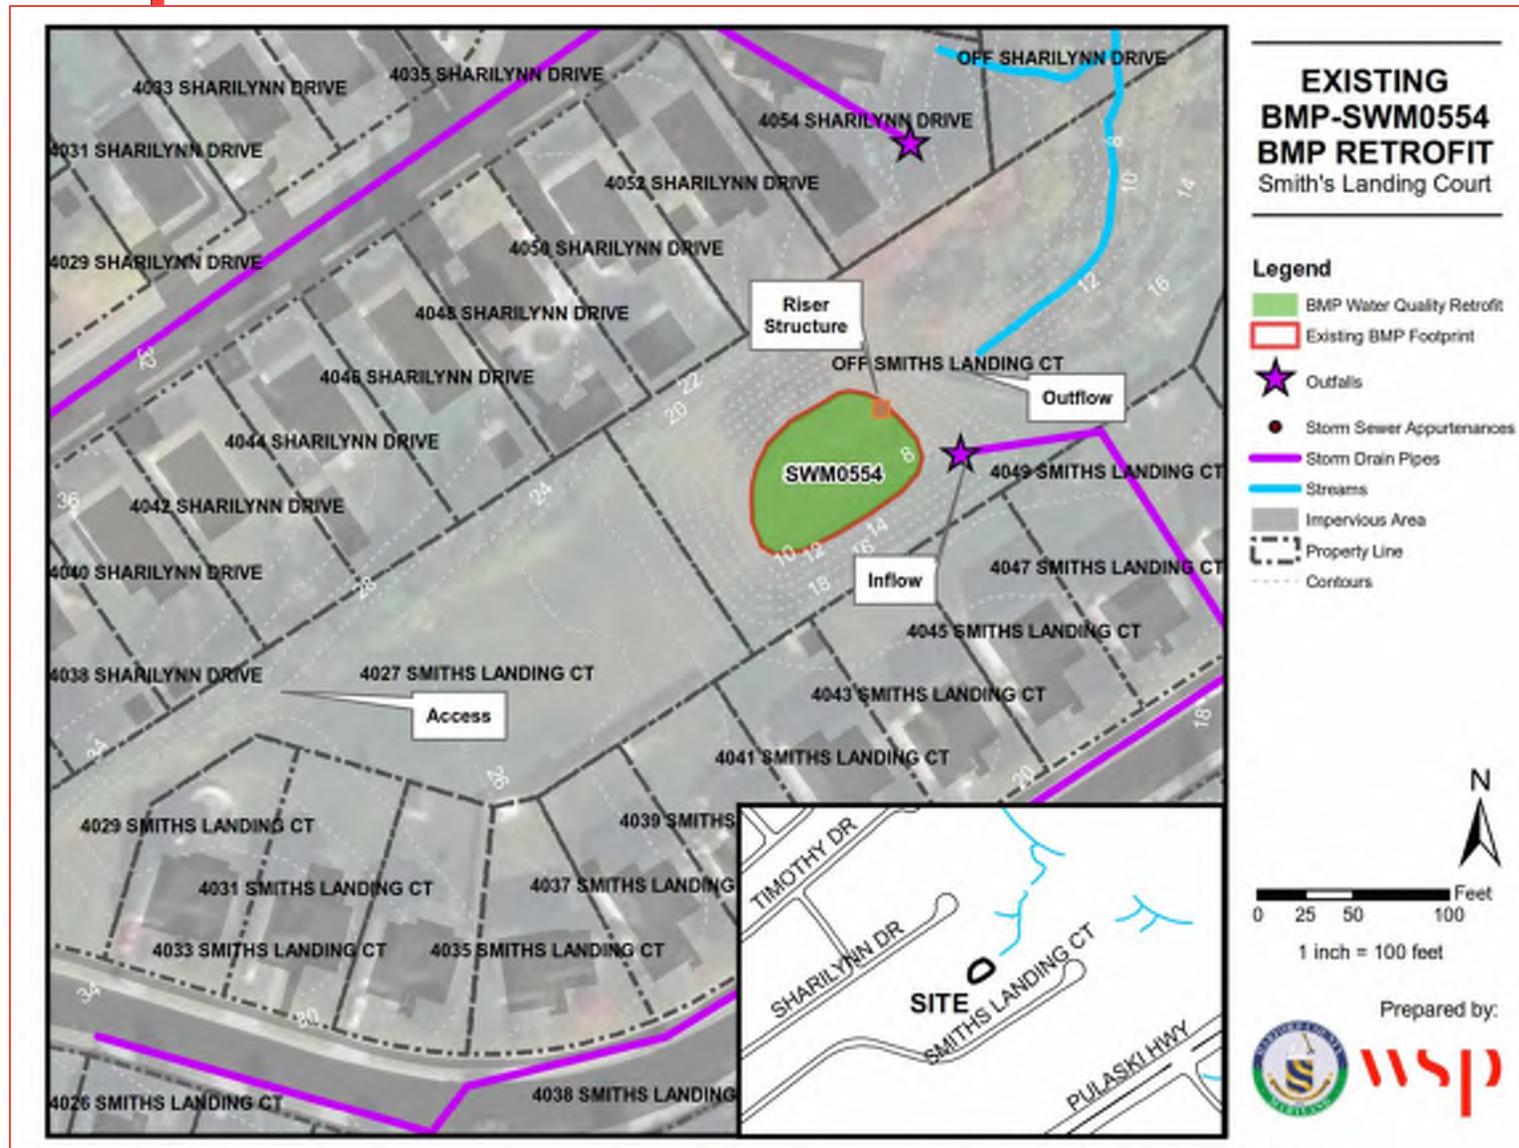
Site Location and Proposed Retrofit for Existing SWM0554
